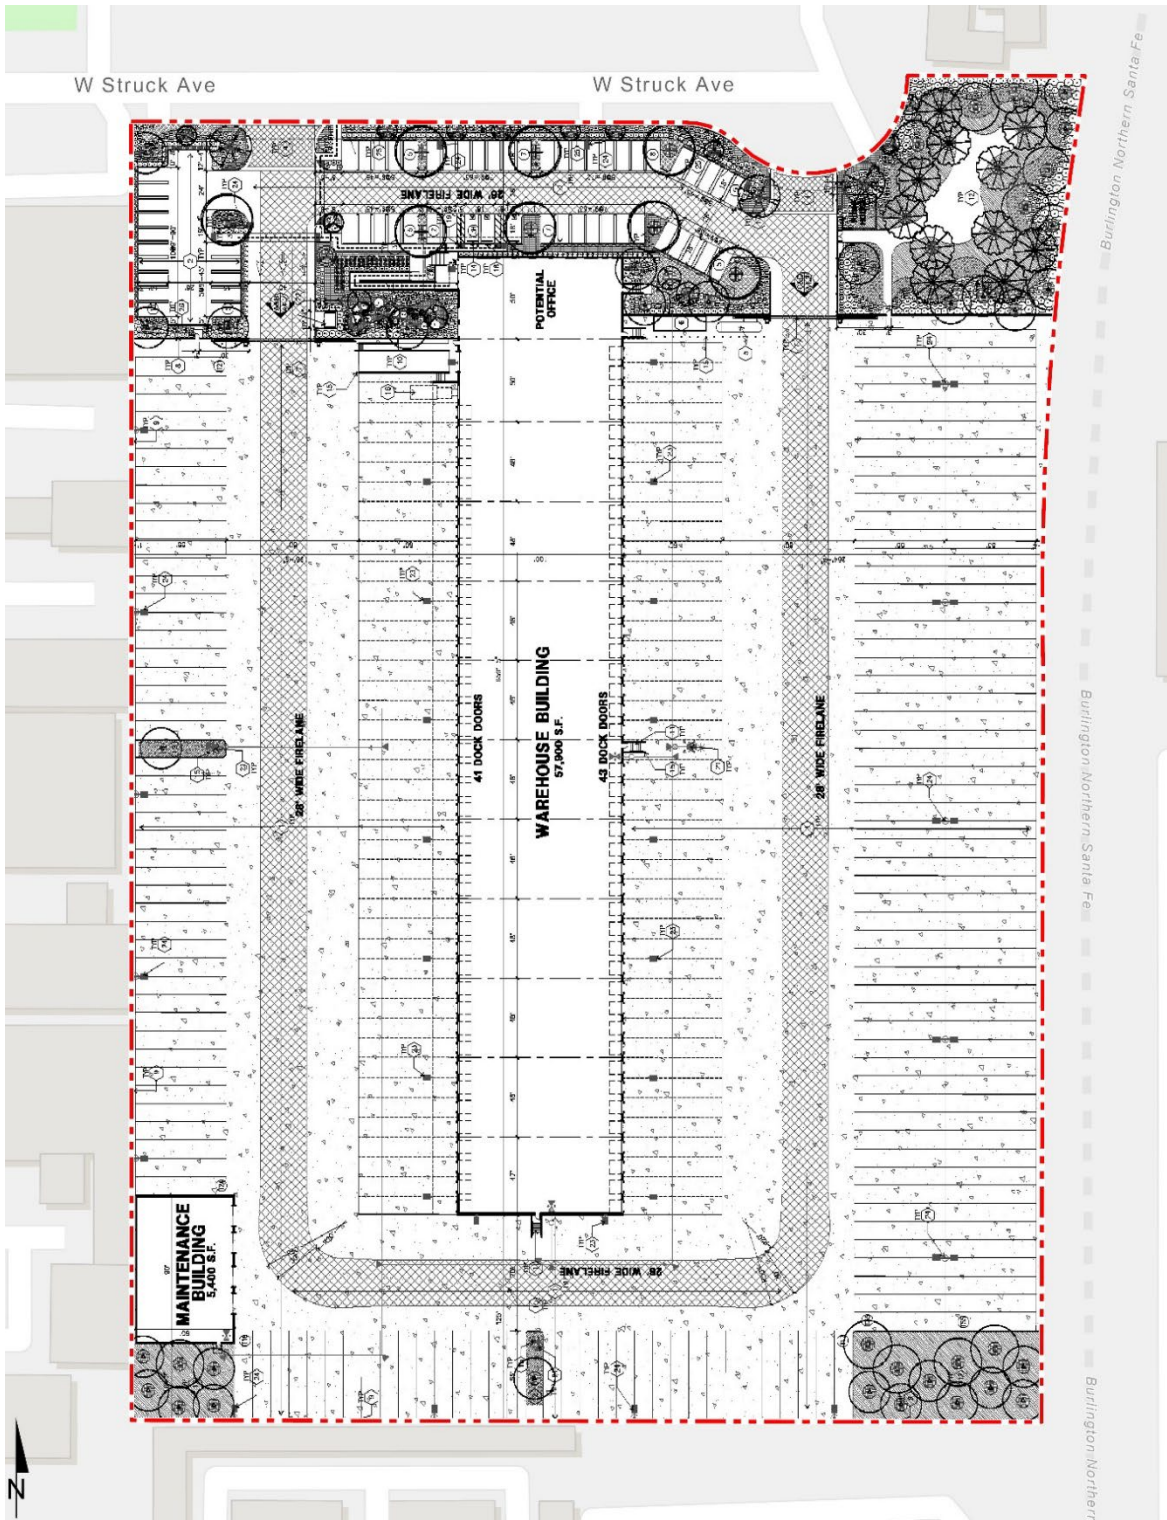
PRELIMINARY SITE PLAN
